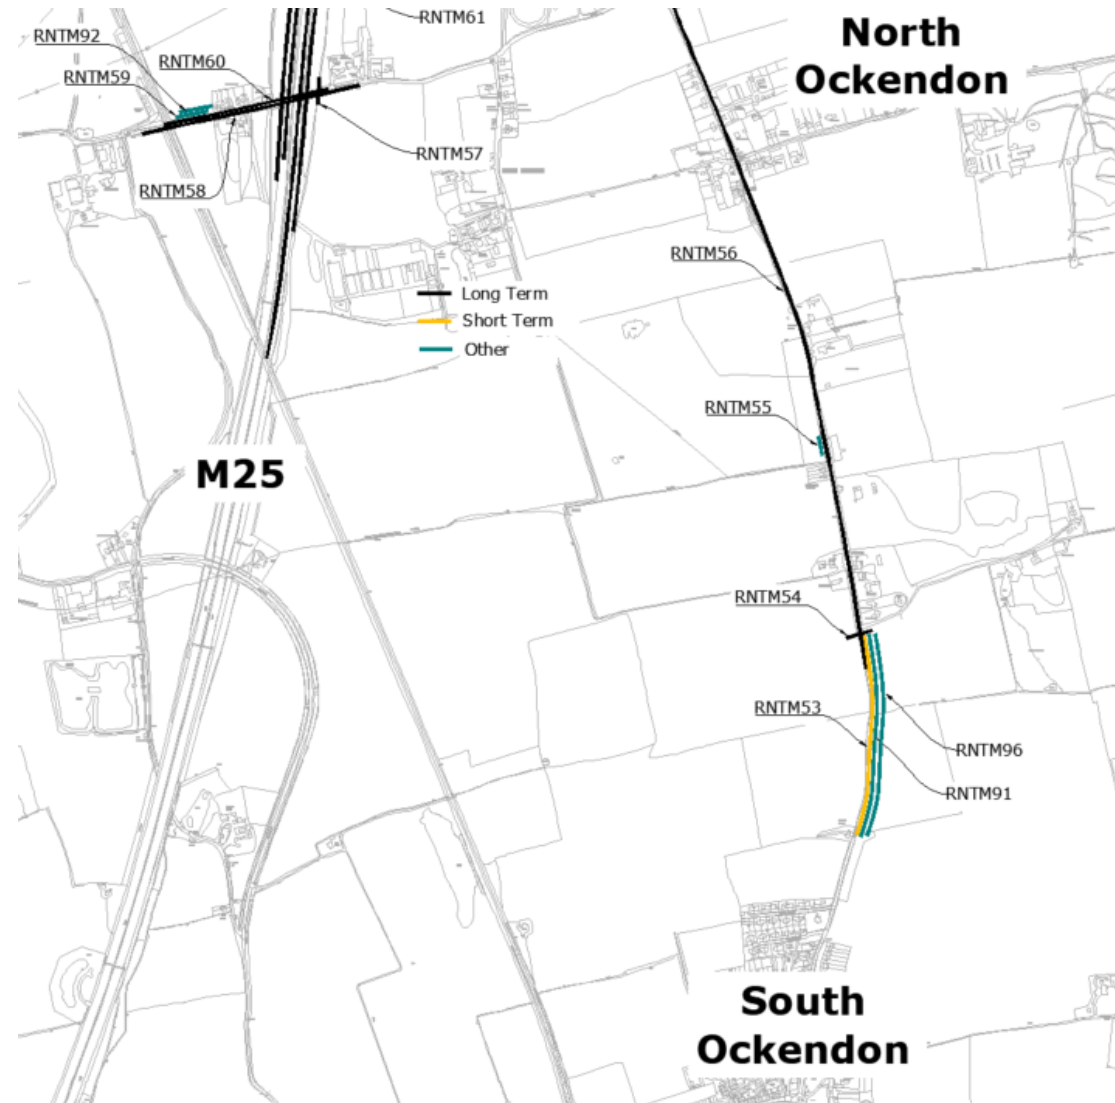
Roads North traffic management measures location plan (6 of 7)
